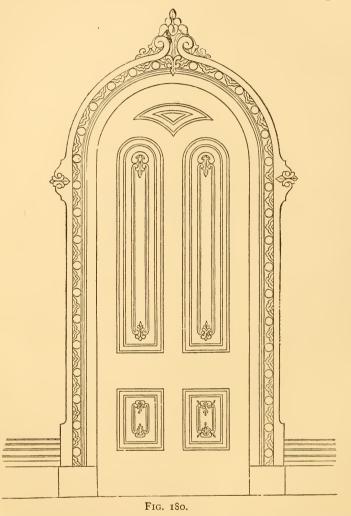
is an elevation of a door and trimmings suitable for the best rooms of a dwelling. (For trimmings generally, see Sect. V.) The number of panels into which a door should be divided may be fixed at pleasure; yet the present style of finishing requires that the number be as small as a proper regard for strength will admit. In some of our best dwellings, doors have been made having only two upright panels. A few years' experience, however, has proved that the omission of the lock-rail is at the expense of the strength and durability of the door; a four-panel door, therefore, is the best that can be made.
